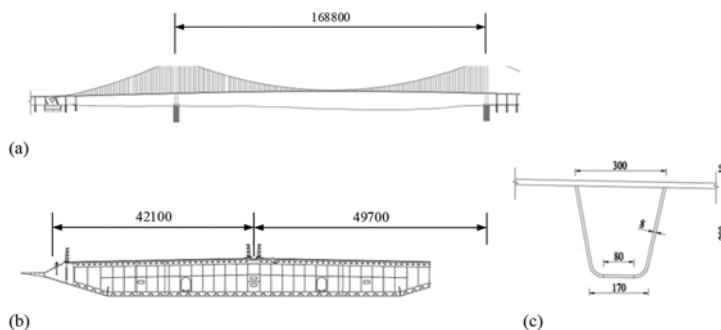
Structural dimensions of steel deck (Unit: mm): (a) bridge elevation; (b) girder cross section; (c) U-rib detail drawing.
